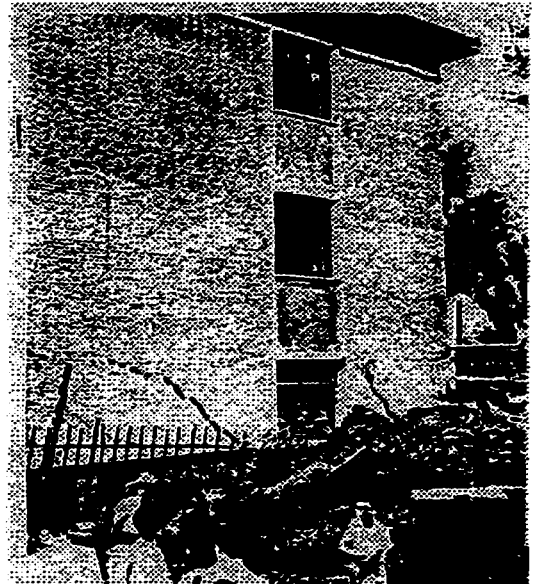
Building Damage Due to Differential Foundation Settlement
